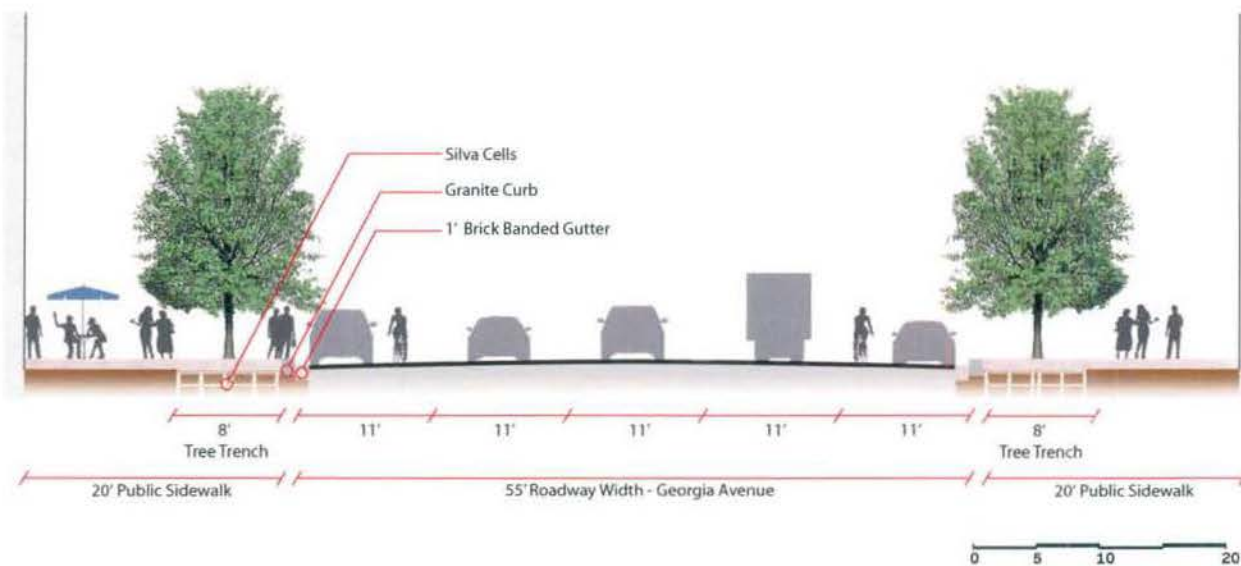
Typical Cross Section of Georgia Avenue at Howard University
